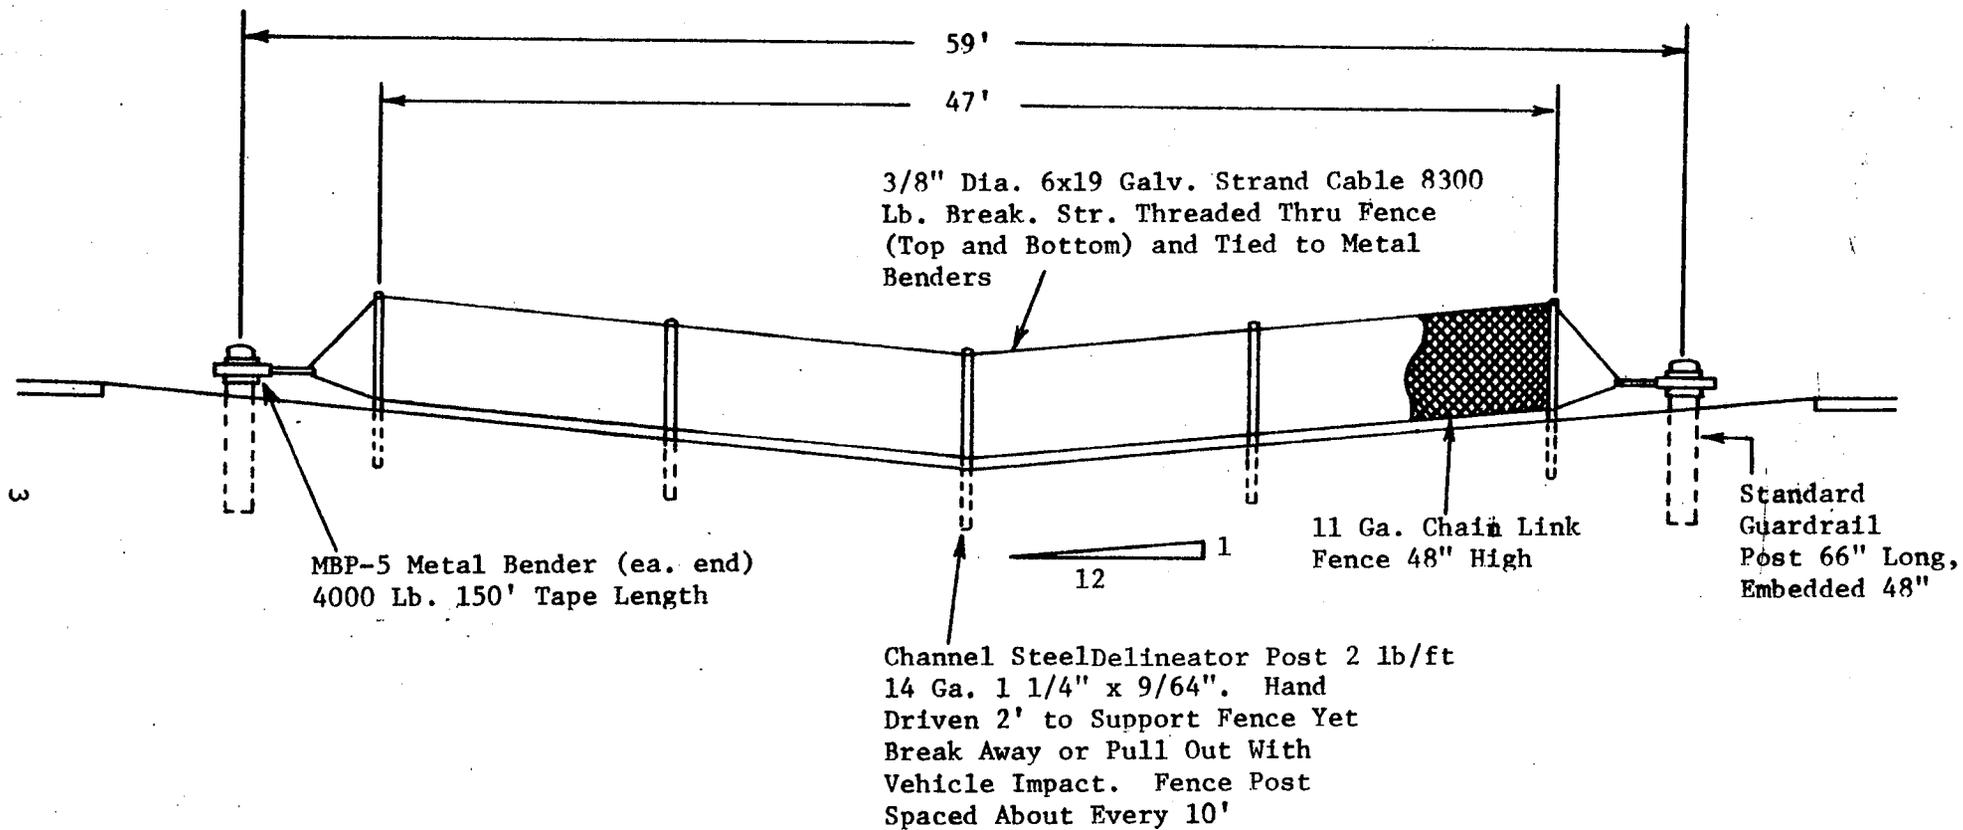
ELEVATION OF MEDIAN INSTALLATION
